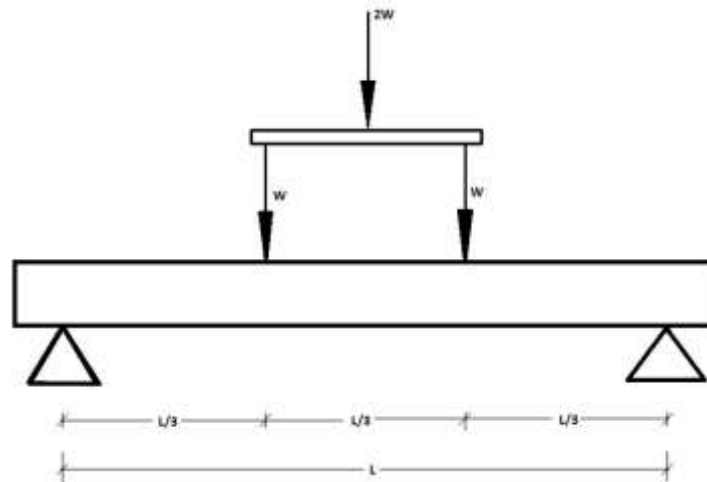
Flexural Test on Bamboo Reinforced Concrete Beam
